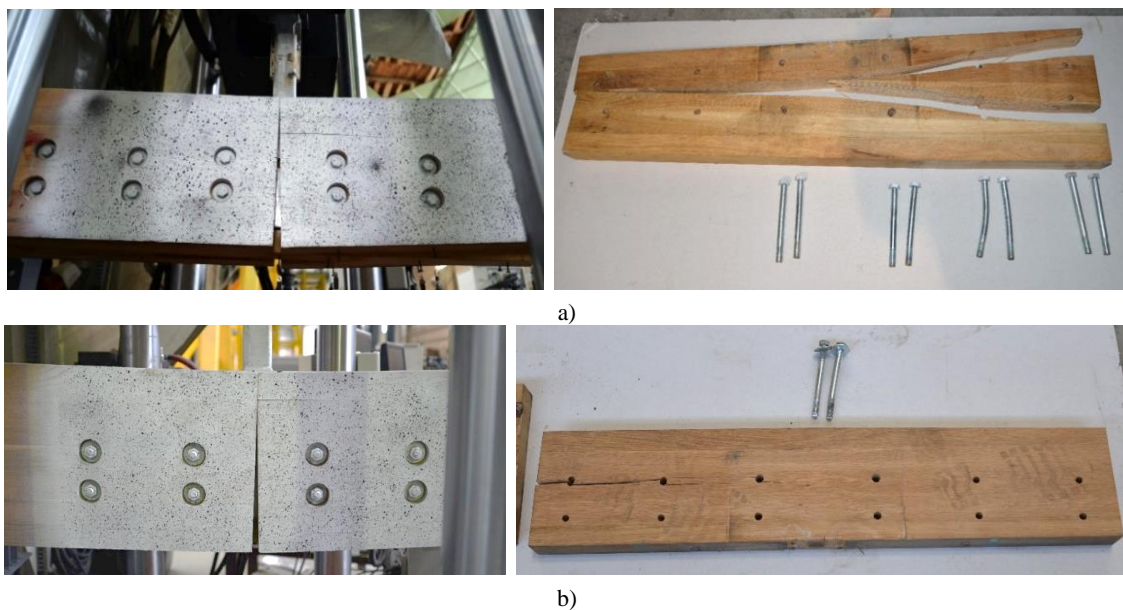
Failure mode: a) specimen S1; b) specimen S2.
